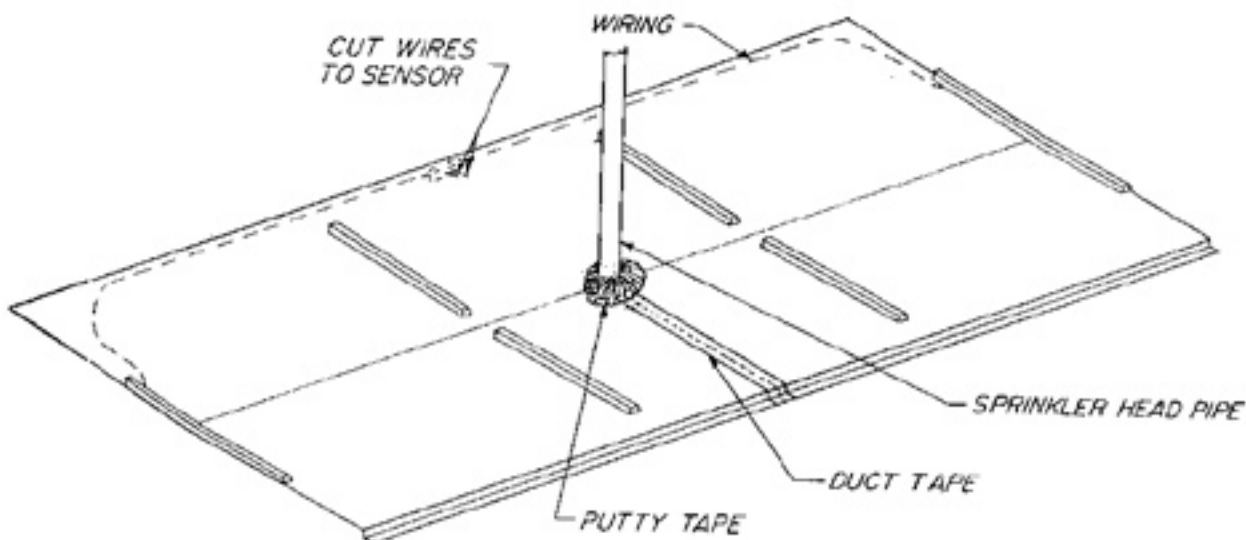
FIGURE J: CENTER LOCATED SPRINKLER HEAD
